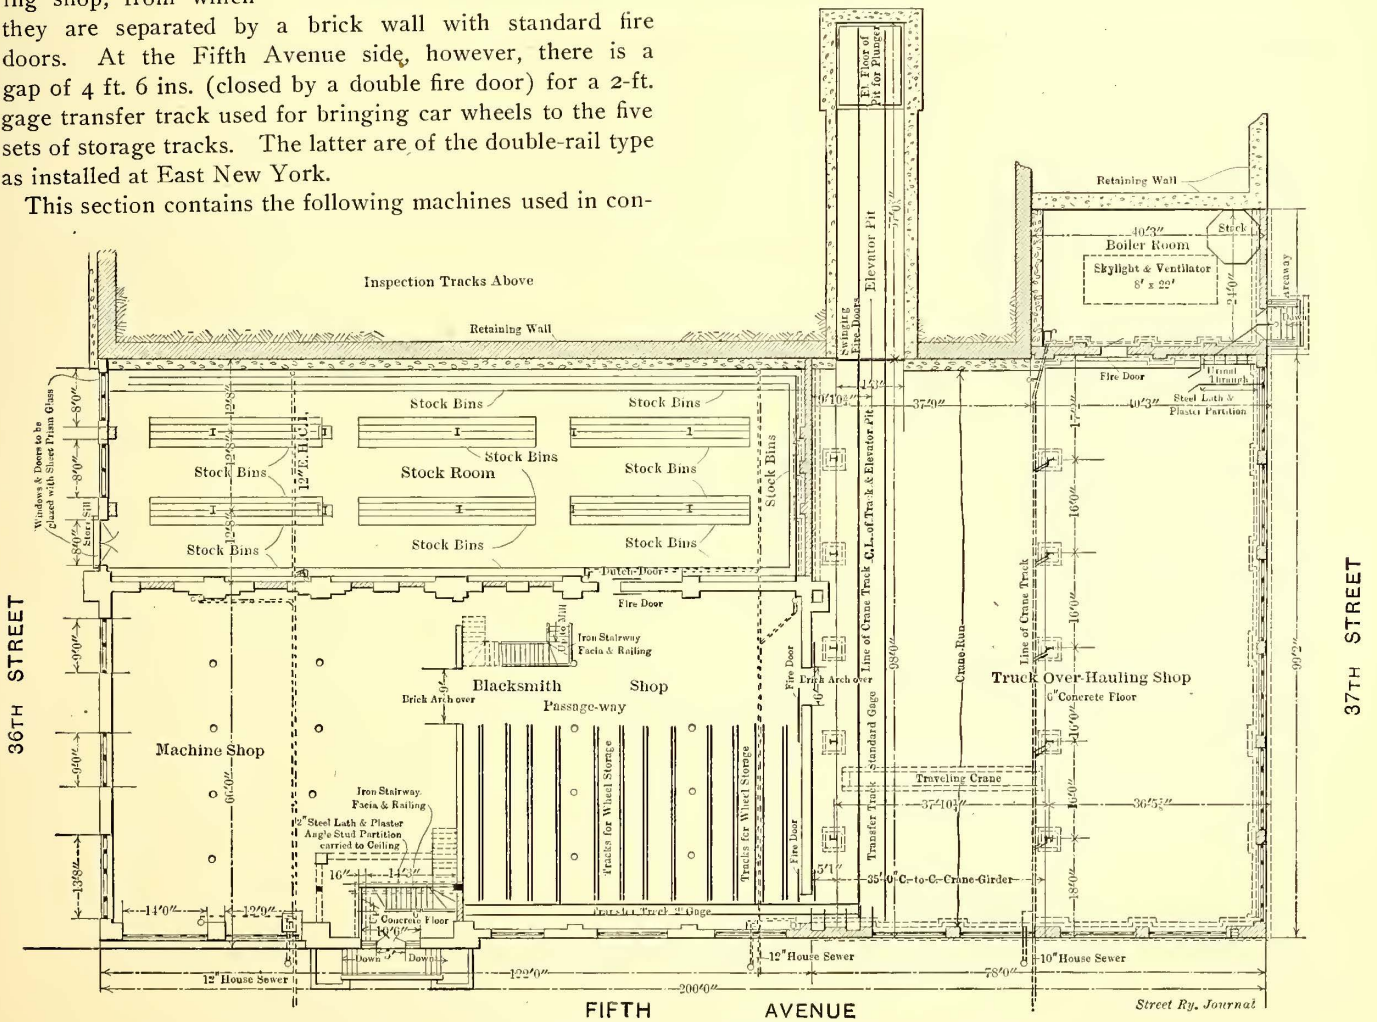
PLAN OF TRUCK-OVERHAULING SHOP AND OF THE DEPARTMENTS UNDER THE MAIN FLOOR OF THE TERMINAL BUILDING
